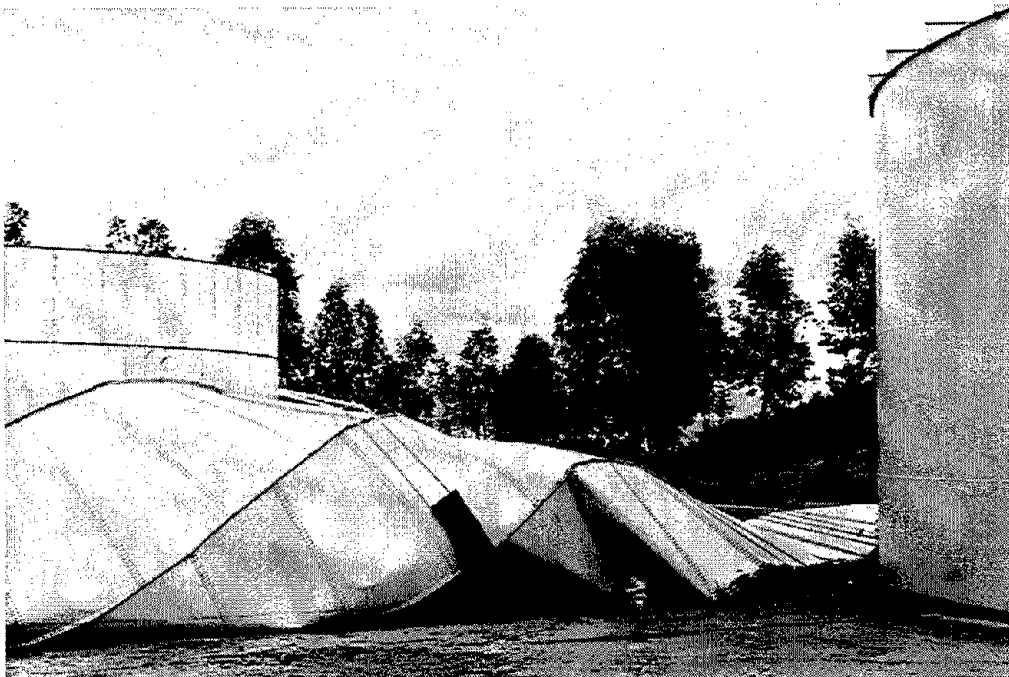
Collapsed 0.50 mg bolted steel tank (MM I) in Valencia area. MM II, at the left, was damaged by outflow from MM I. Large tank to right was undamaged. (T. Cooper)
